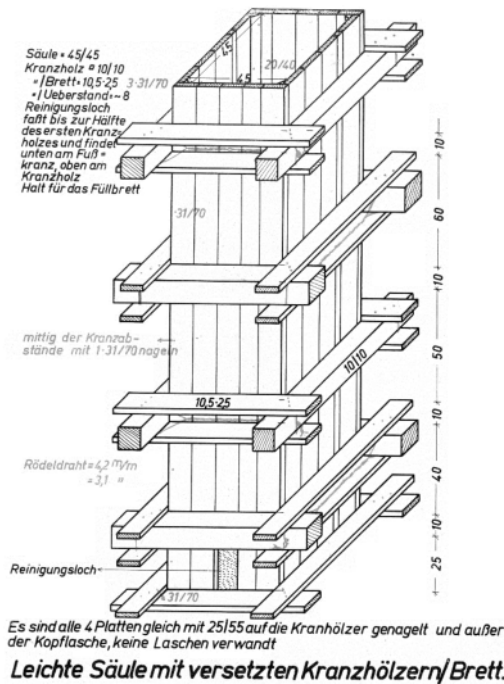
Drawing of the formwork for a column in the book *Betonbauer* (Kupfer 1938, 72).
